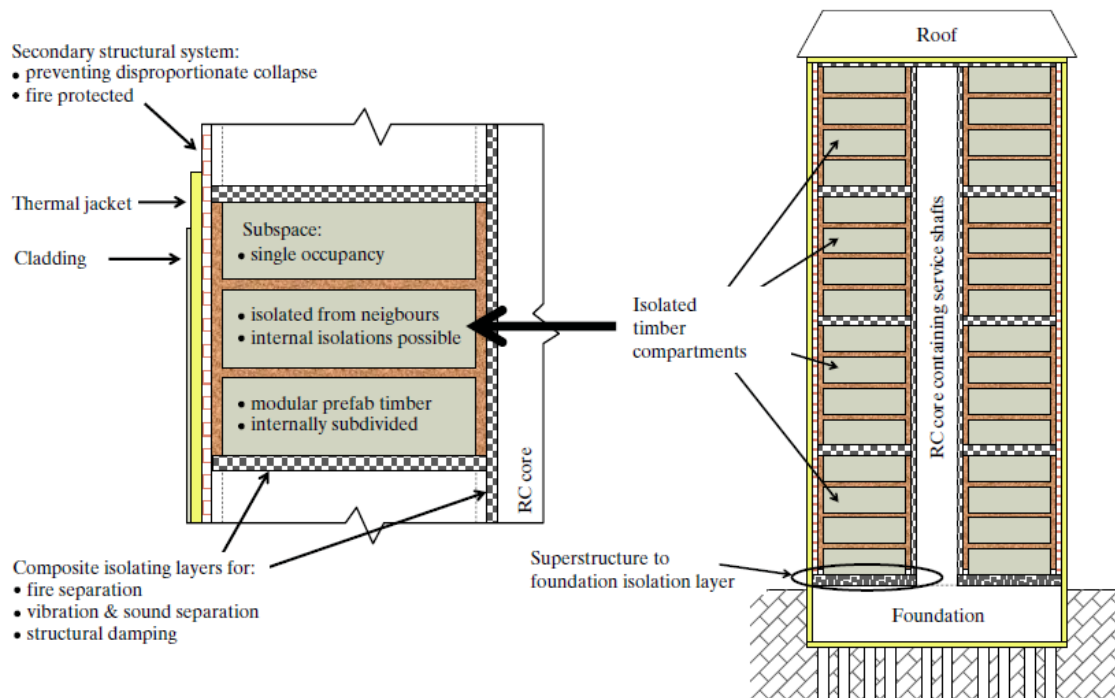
Conceptual 16 storey Wood/concrete Hybrid Building (Smith, 2008b)
